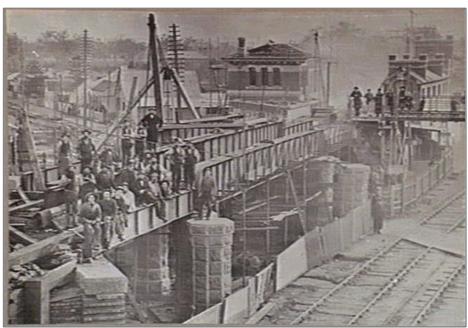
Workmen on Rail Bridge over Swan Street c1885 (SLV Image No. b21194)
